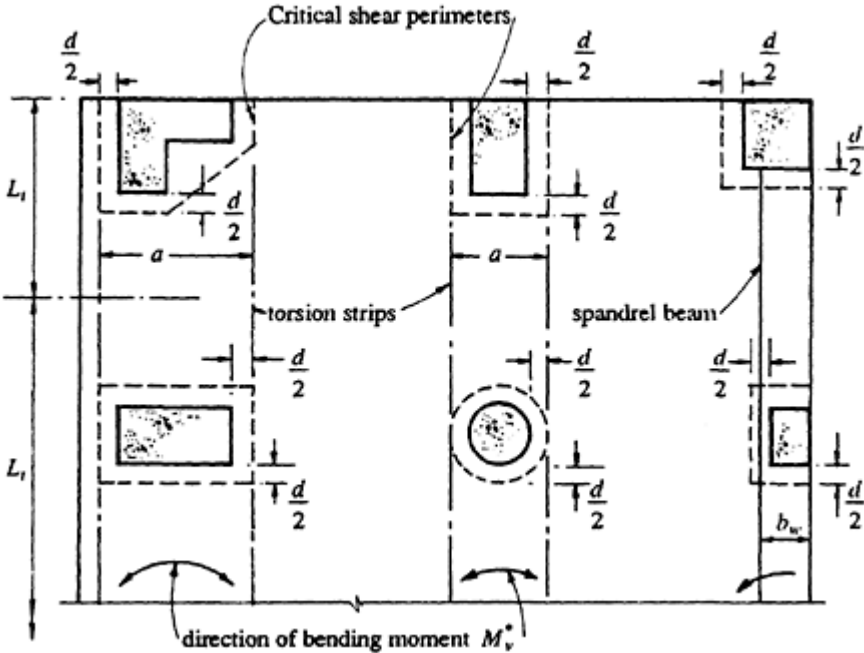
Torsion strips and spandrel beams (from AS 3600–1988).
